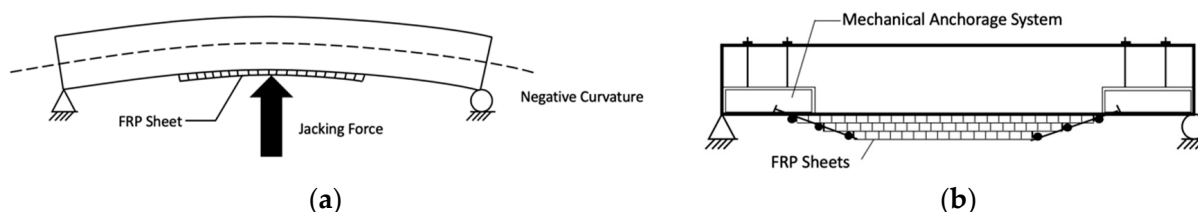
FRP prestressing systems for concrete beams developed by (a) Saadatmanesh and Ehsani and (b) Wight et al. [16].
